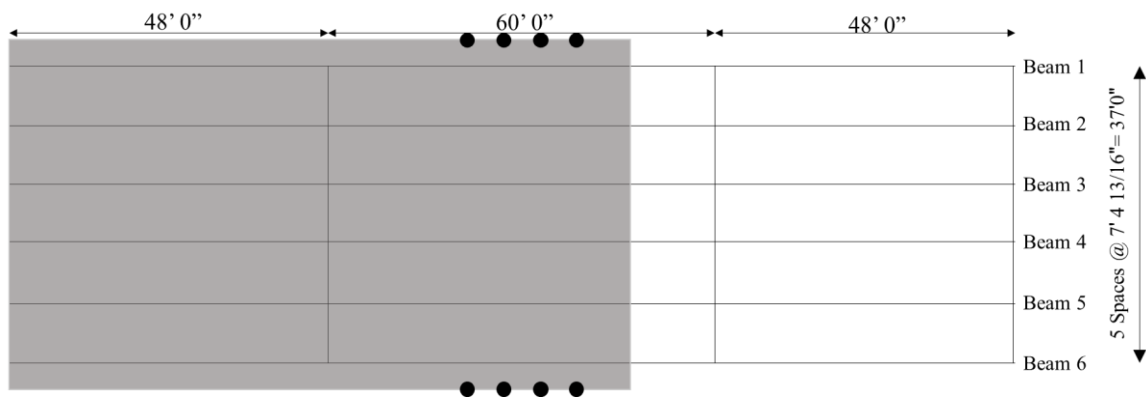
Span 2 vehicle and wet concrete load for 160 ft Standard Bridge
